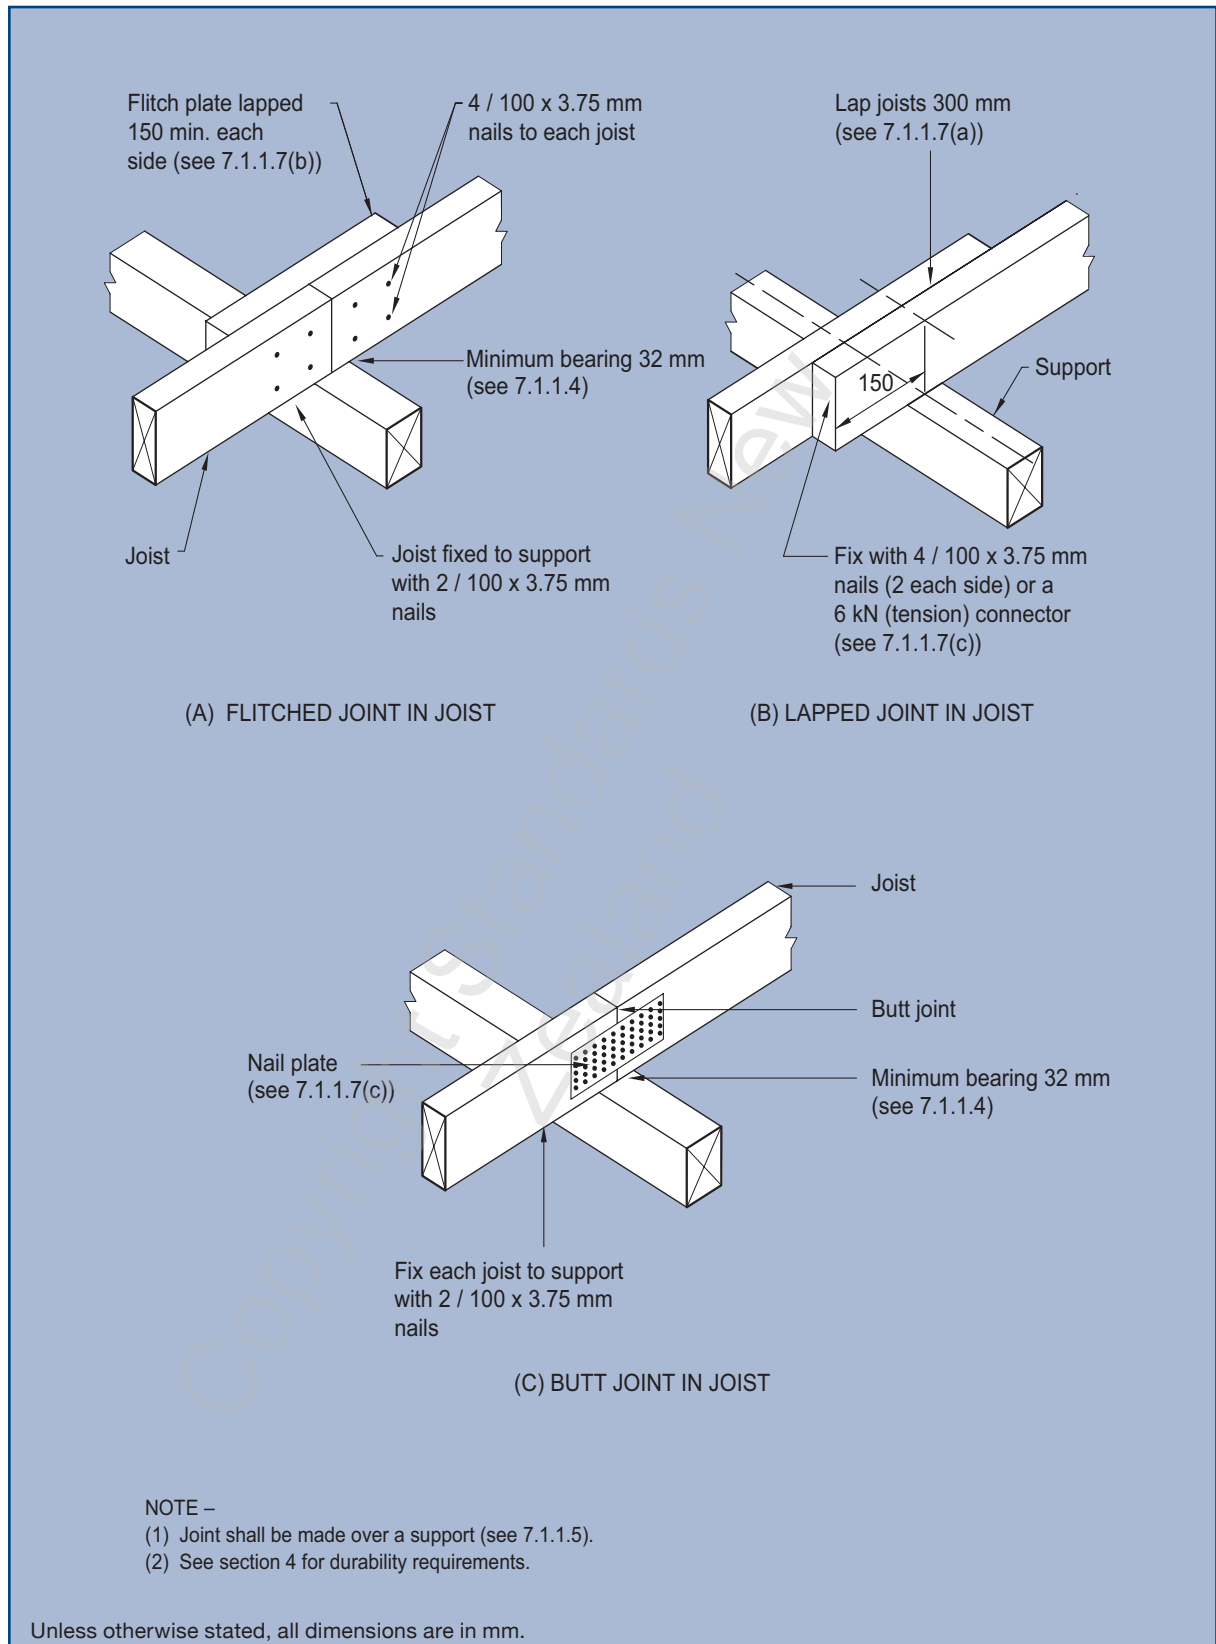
Lapped or butted joints in floor joists (see 7.1.1.7)
